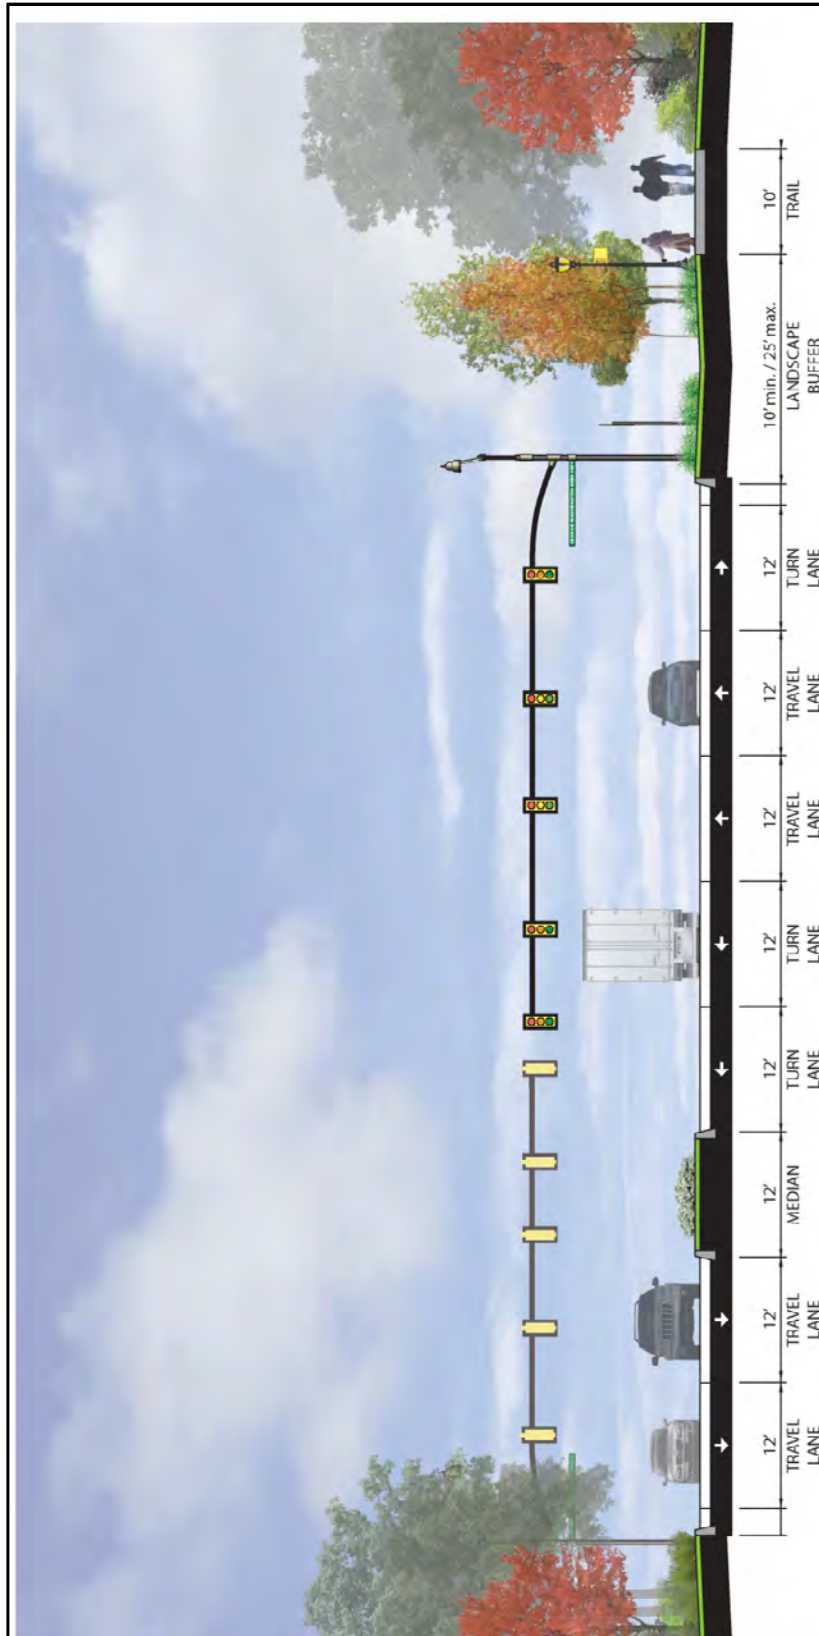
Typical cross-section on the north leg of Route 17 Bypass (south)/Main Street
